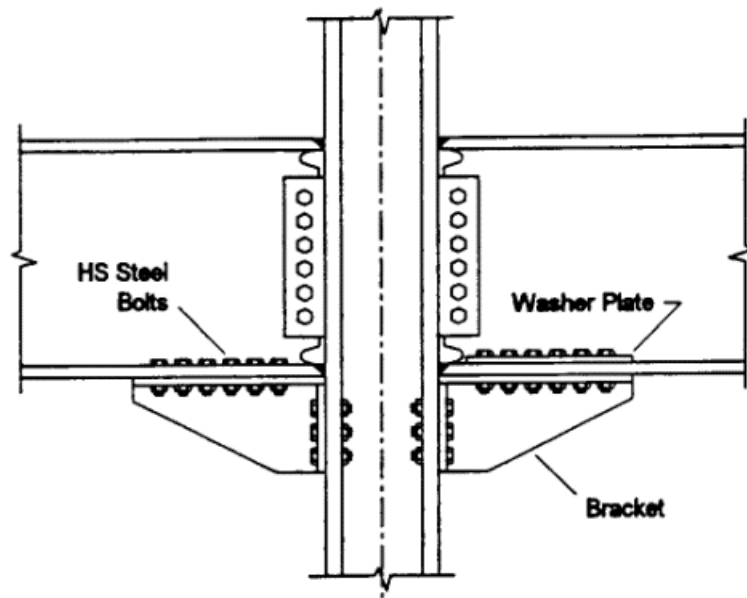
Bolted Bracket Connection, Haunch Type
